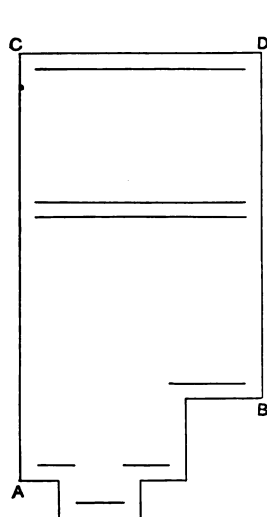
Method of Drawing Foundation Plan.—Scale, 1-16 Inch to the Foot.
